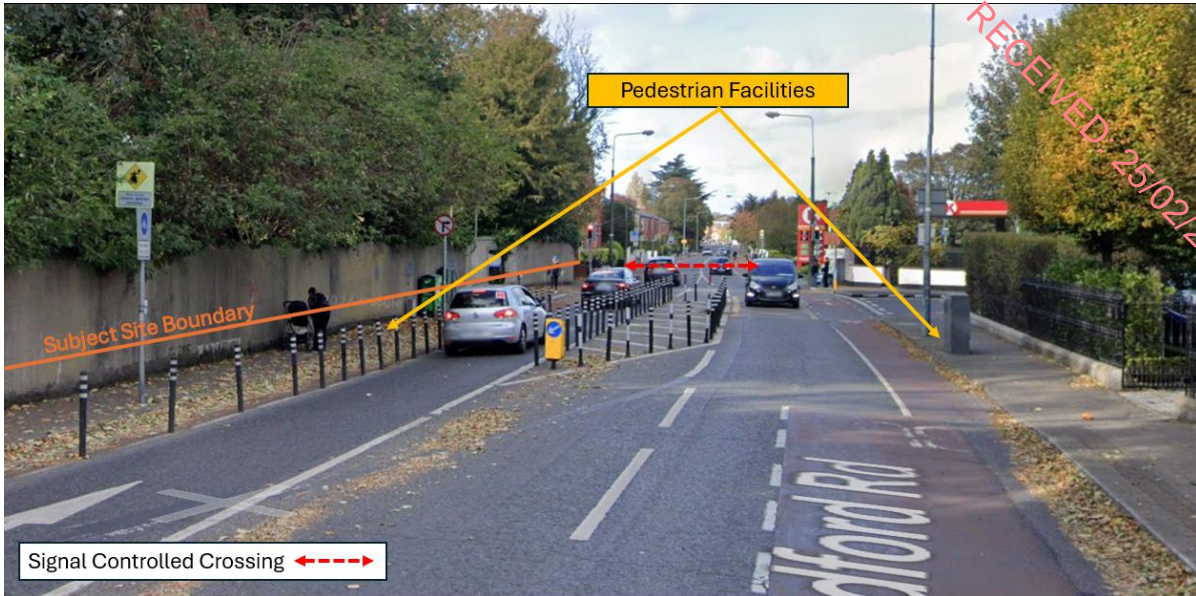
Existing Pedestrian Facilities along Sandford Road in vicinity of existing site access
